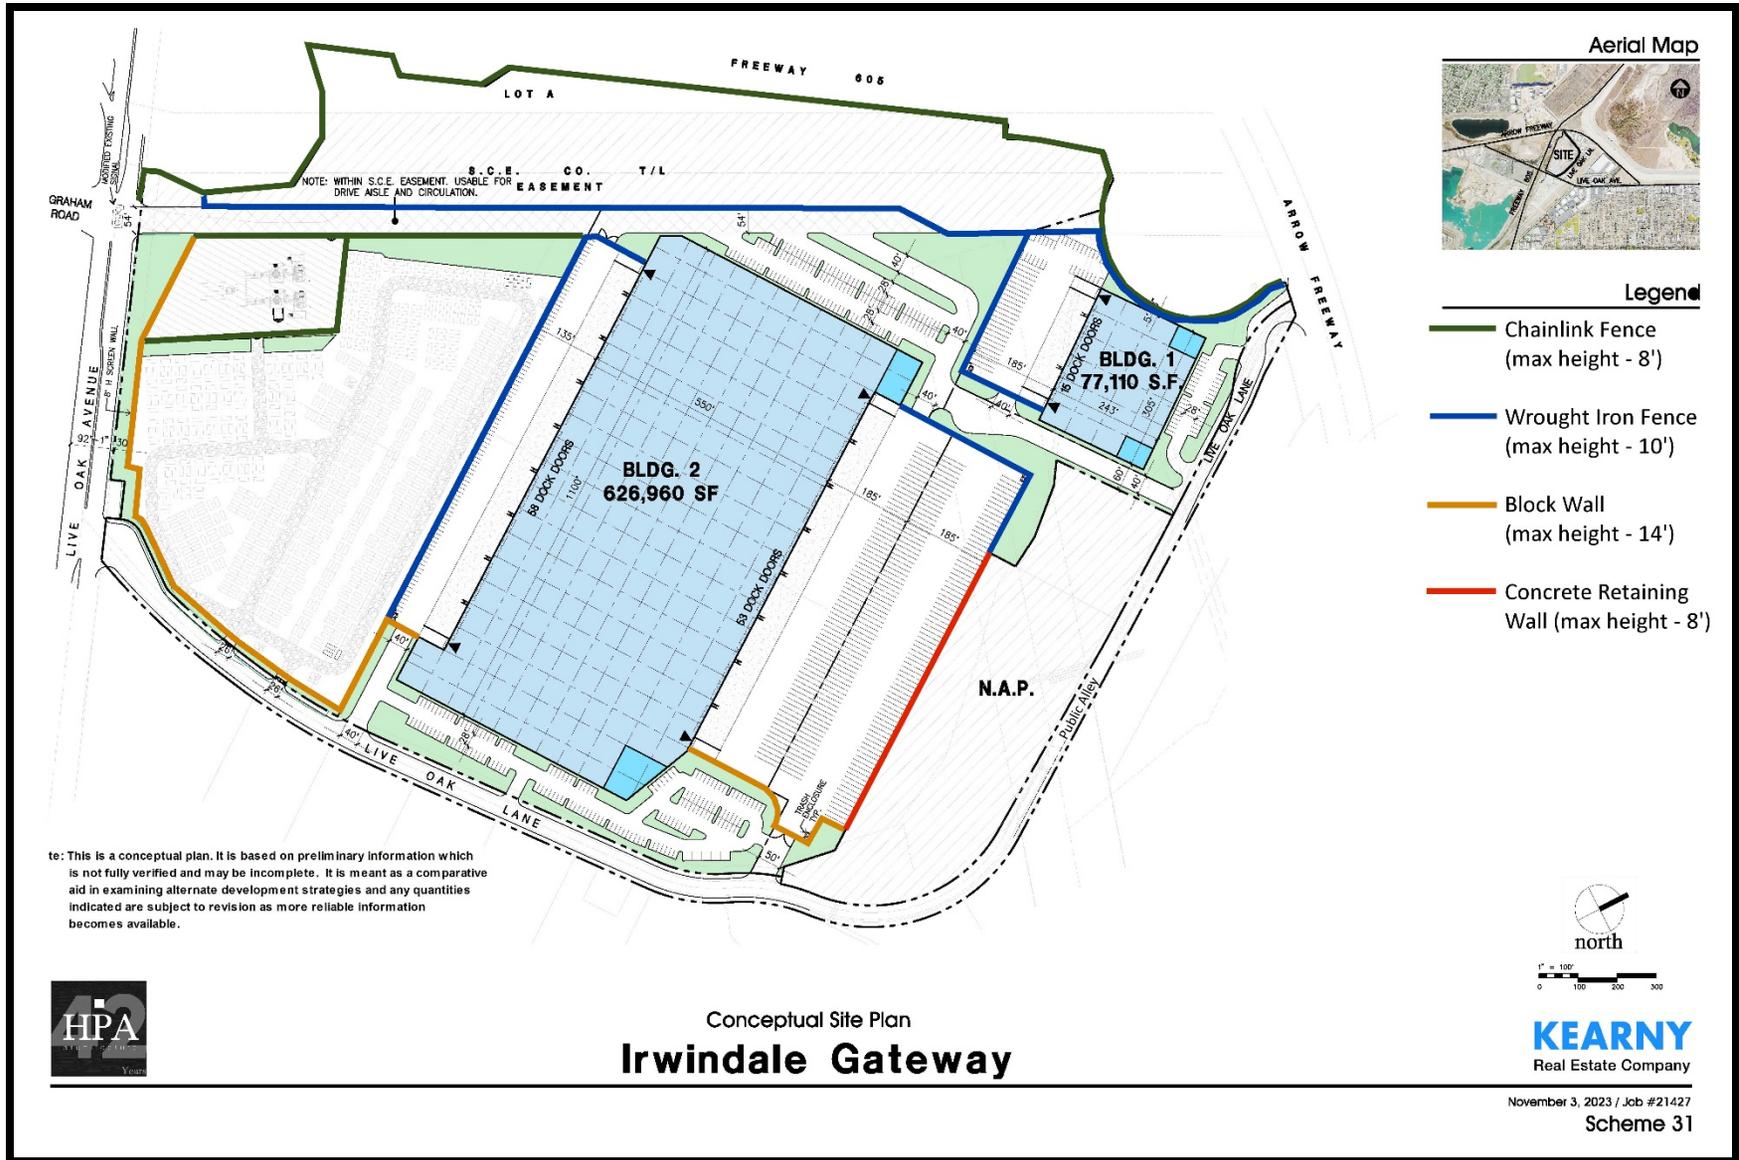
FENCE AND WALL PLAN WITH BESS
